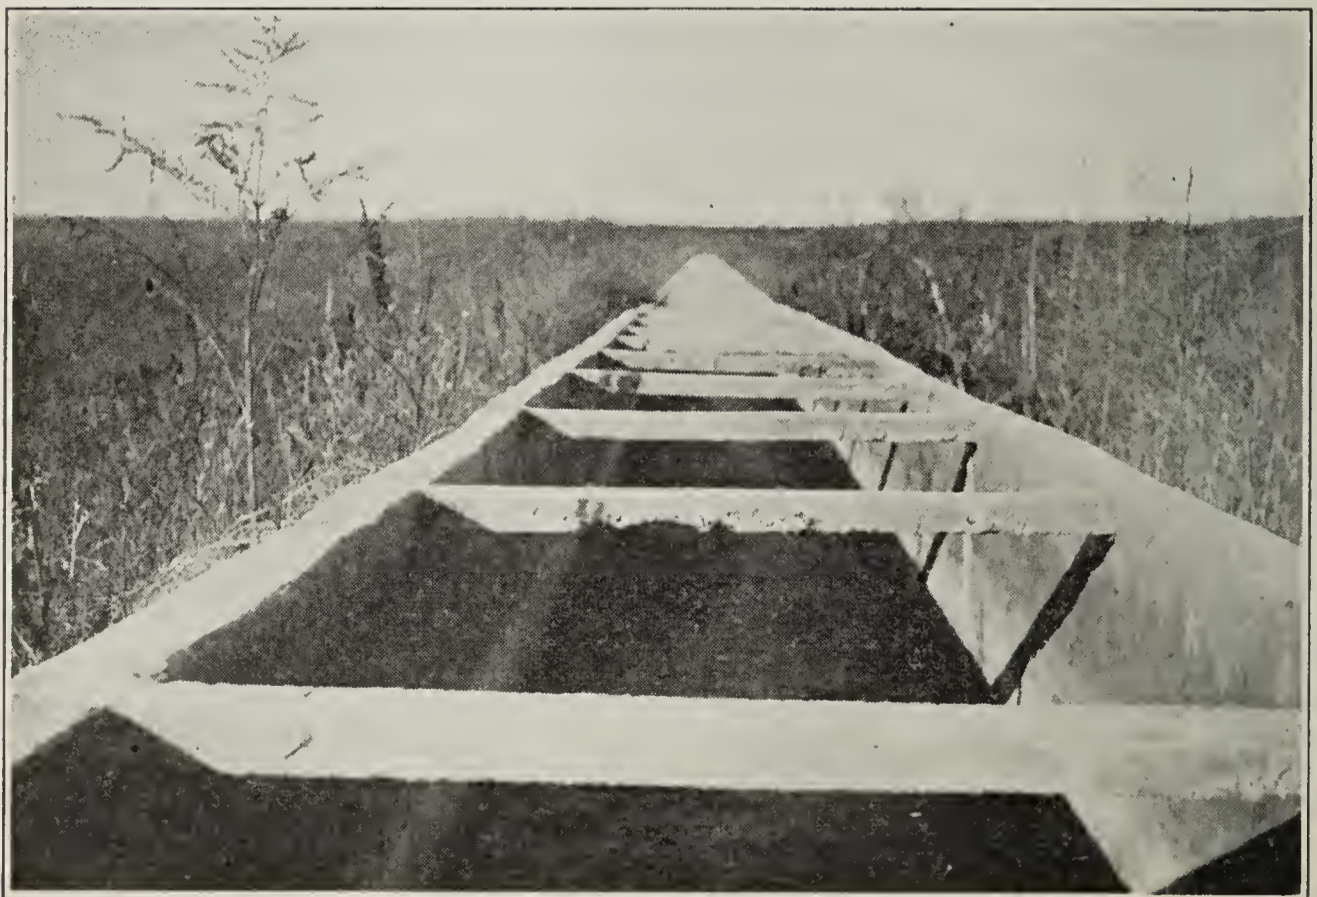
Plate VI. Concrete Flume, Long Pond, Fort Collins.
